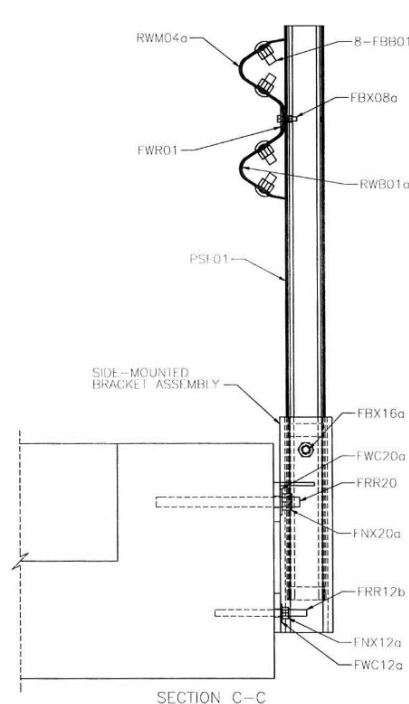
Side-Mounted Guardrail (FHWA Ref. B-264)
